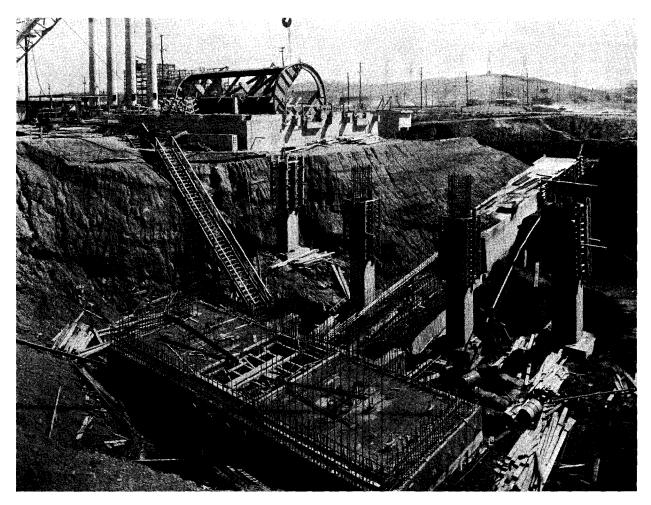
Construction progress as of March 20, 1953, showing placement of concrete for hopper building No. 2, BC-10 tunnel, and erection of the rotary car dumper in hopper building No. 1.
